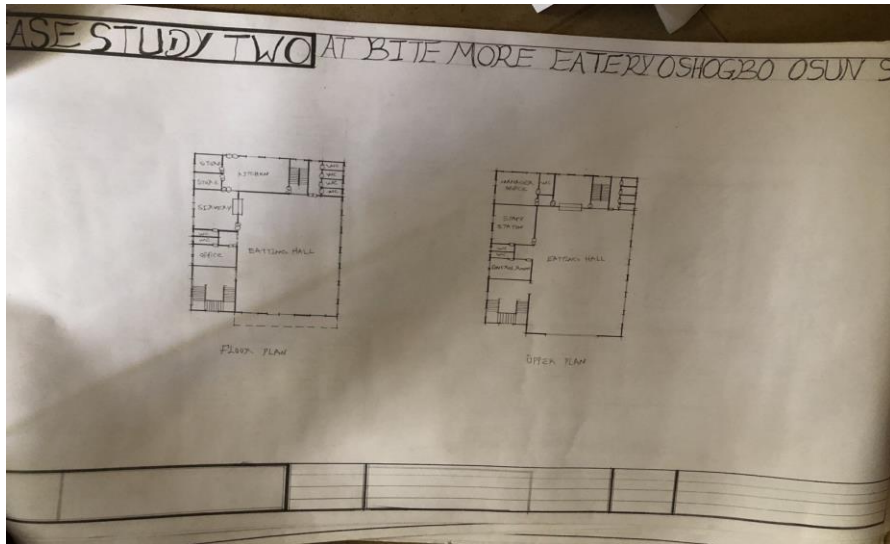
FLOOR PLAN OF CASE STUDY TWO
